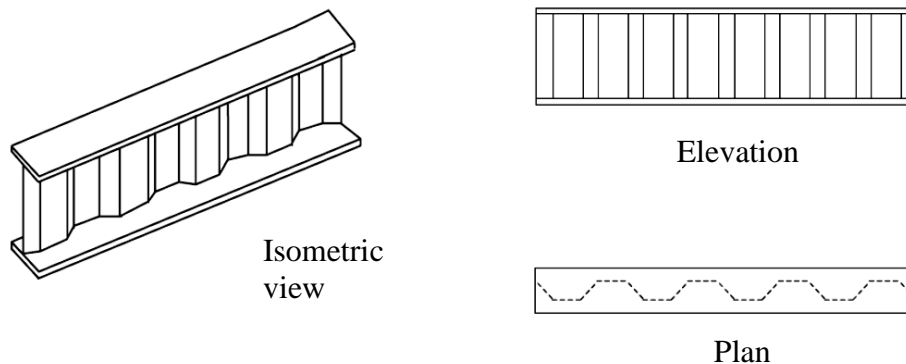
A typical shape of trapezoid web section (Tahir et al., 2008)
